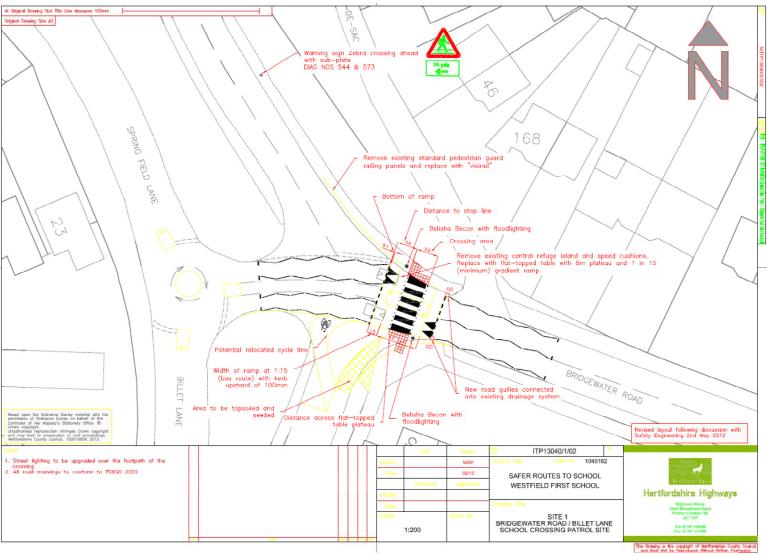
Formal Crossing at Bridgewater Road / Billet Lane
